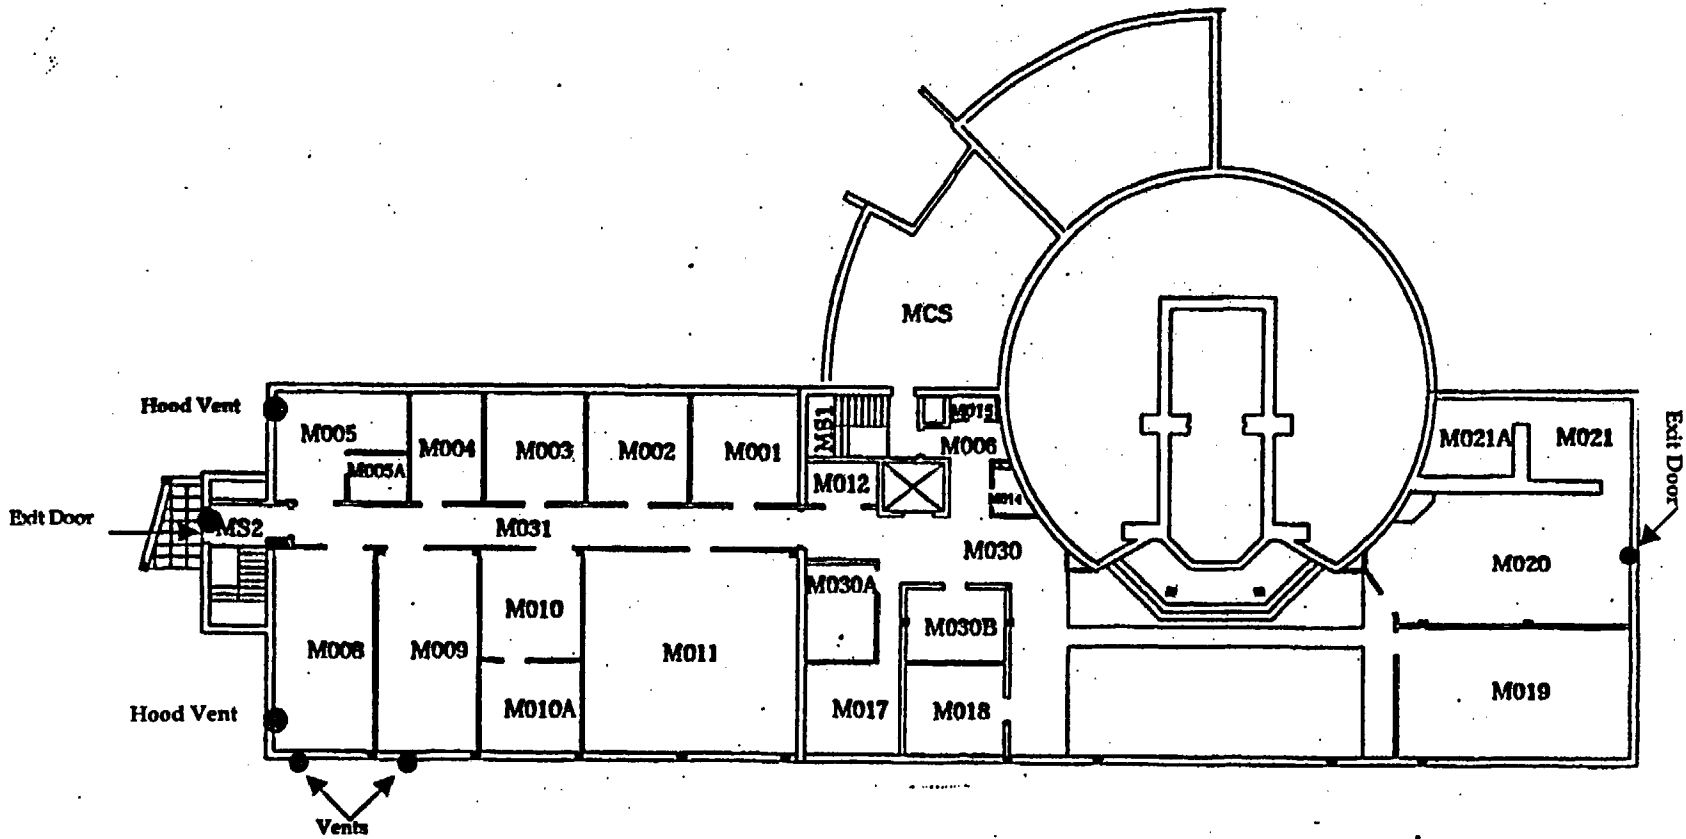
UVA Mezzanine Floor Plan View Indicating Survey Locations on Exterior Building Surfaces.
